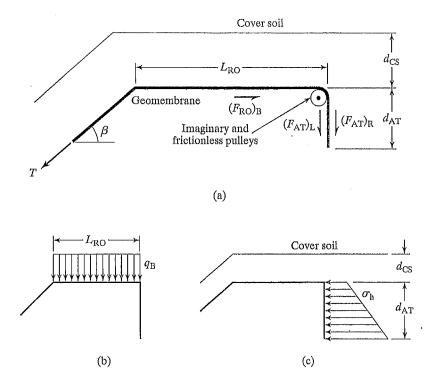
Cross Section of Geomembrane Runout Section with a Rectangular Anchor Trench and Related Stresses and Forces Involved
